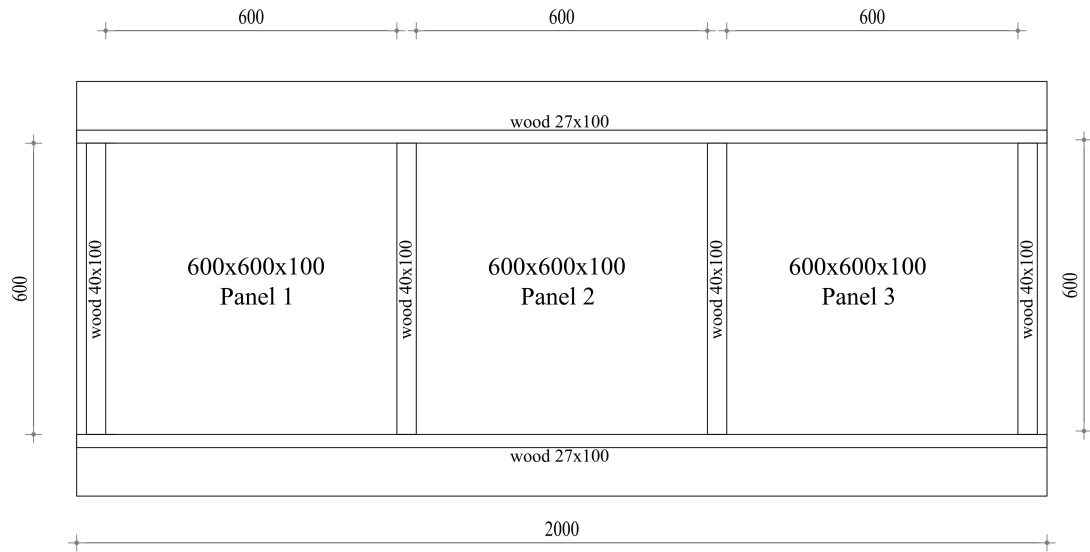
Square panels (600 mm x 600 mm x 100 mm) and wood moulds for sprayed and cast panels, dimensions in [mm].
